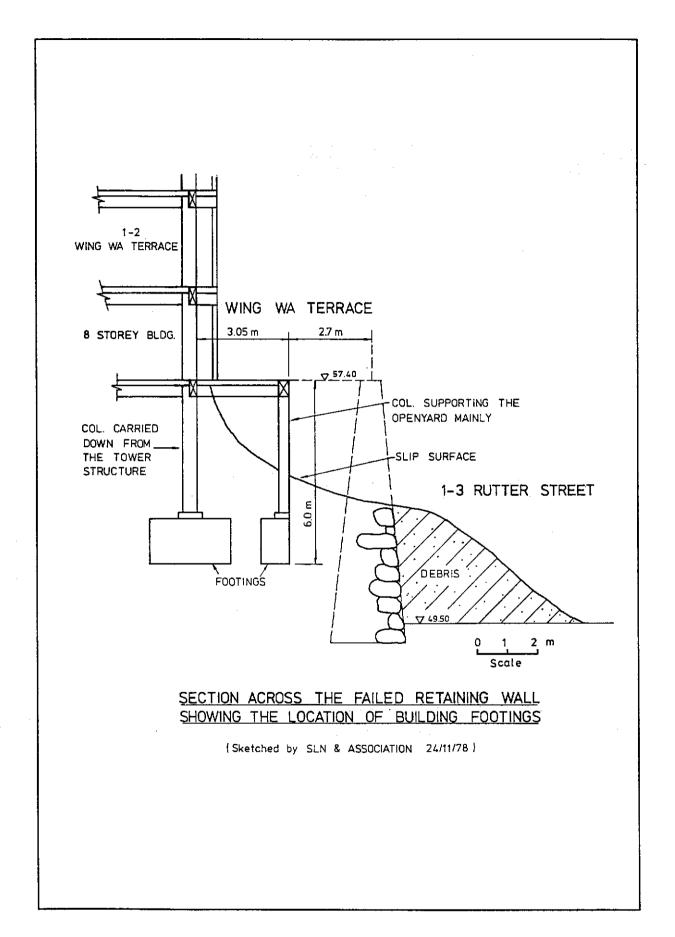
Retaining Wall at Wing Wa Terrace - Section of the Failure
